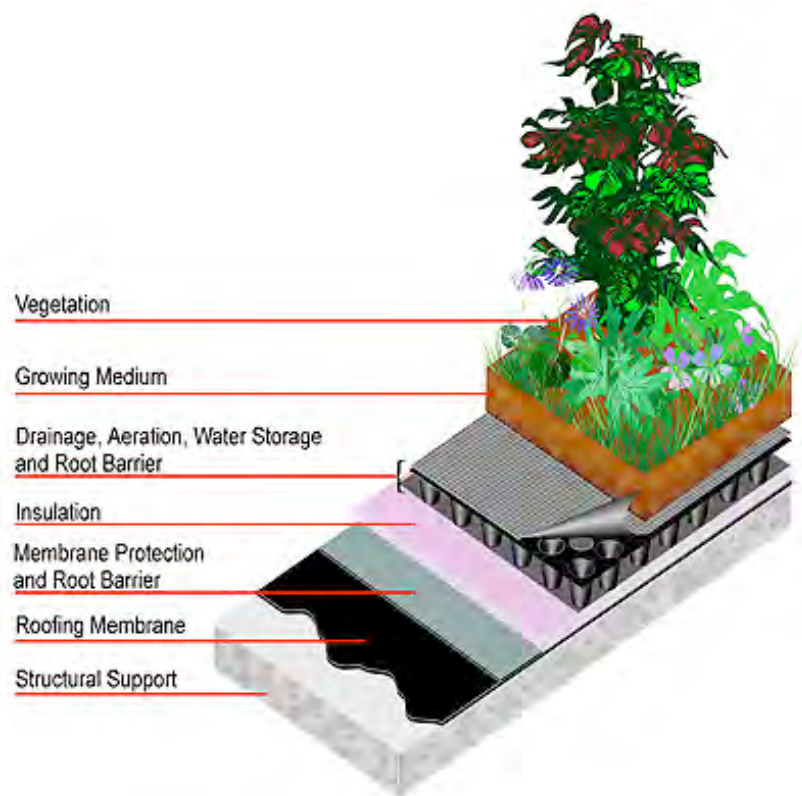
Typical Green Roofing Layers⁴⁹⁸
